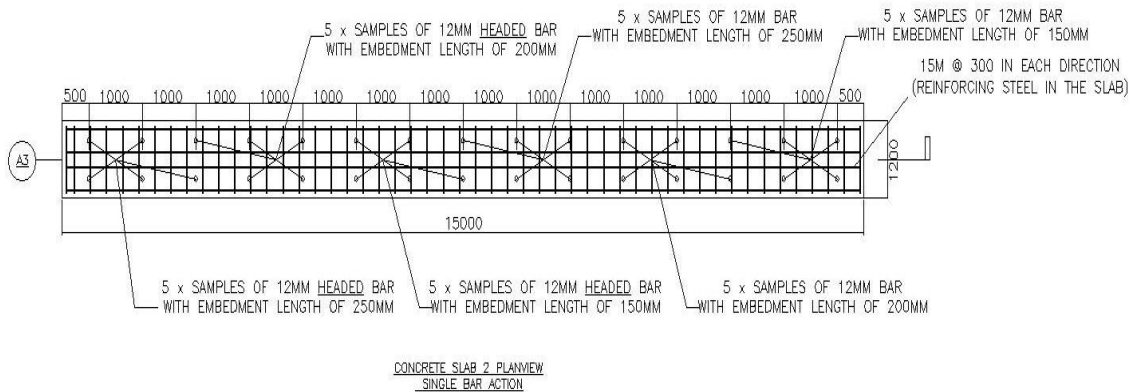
12M bar position in concrete slab, casted for pullout tests and dimensions of the casted slab.
